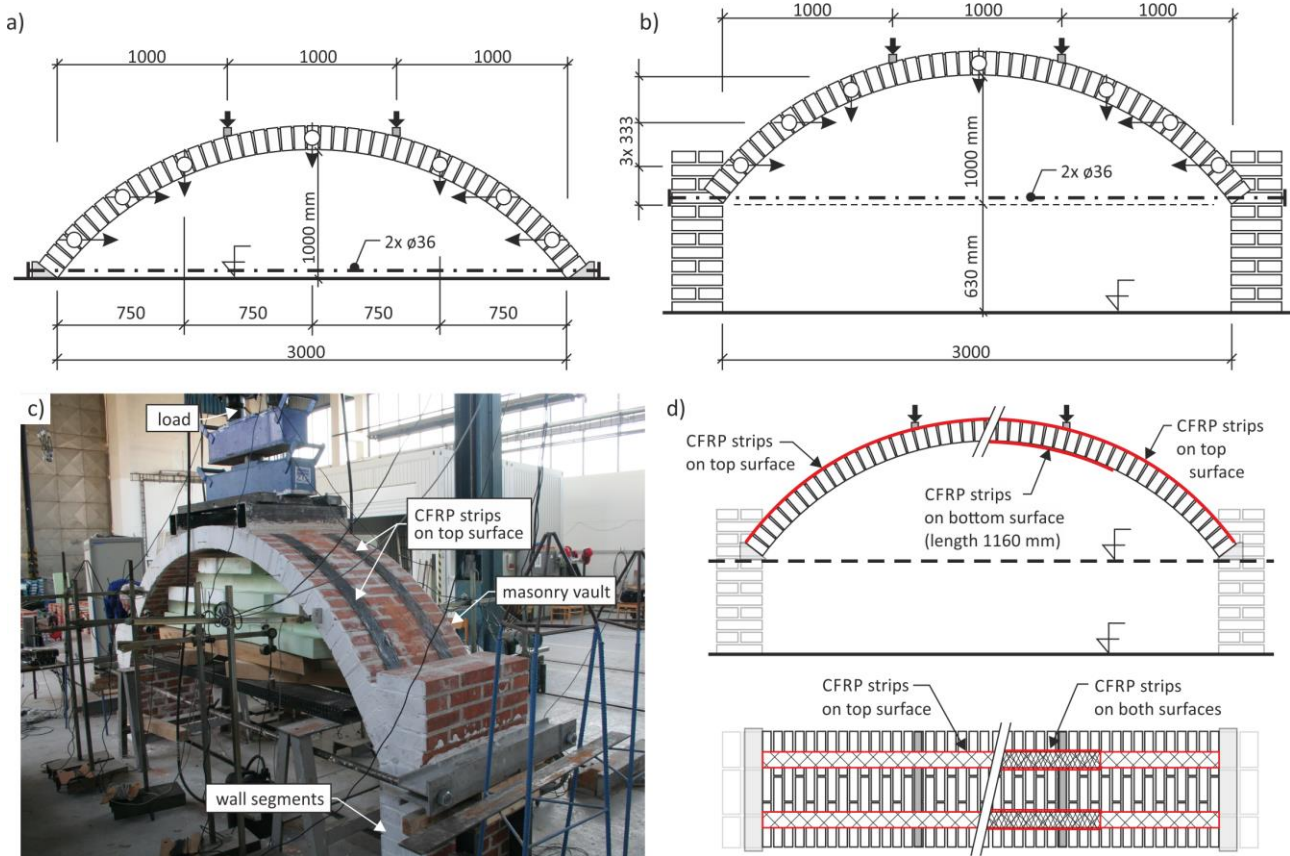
a) Scheme of a vaulted structure mounted on the floor, b) Scheme of a vaulted structure mounted on supporting wall segments, c) Reinforced vault in the testing device, d) Scheme of vault reinforcement with FRP strips
